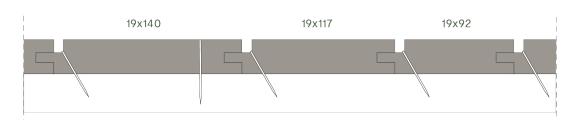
Hidden fixing of cladding boards using headless nails for boards of different widths
